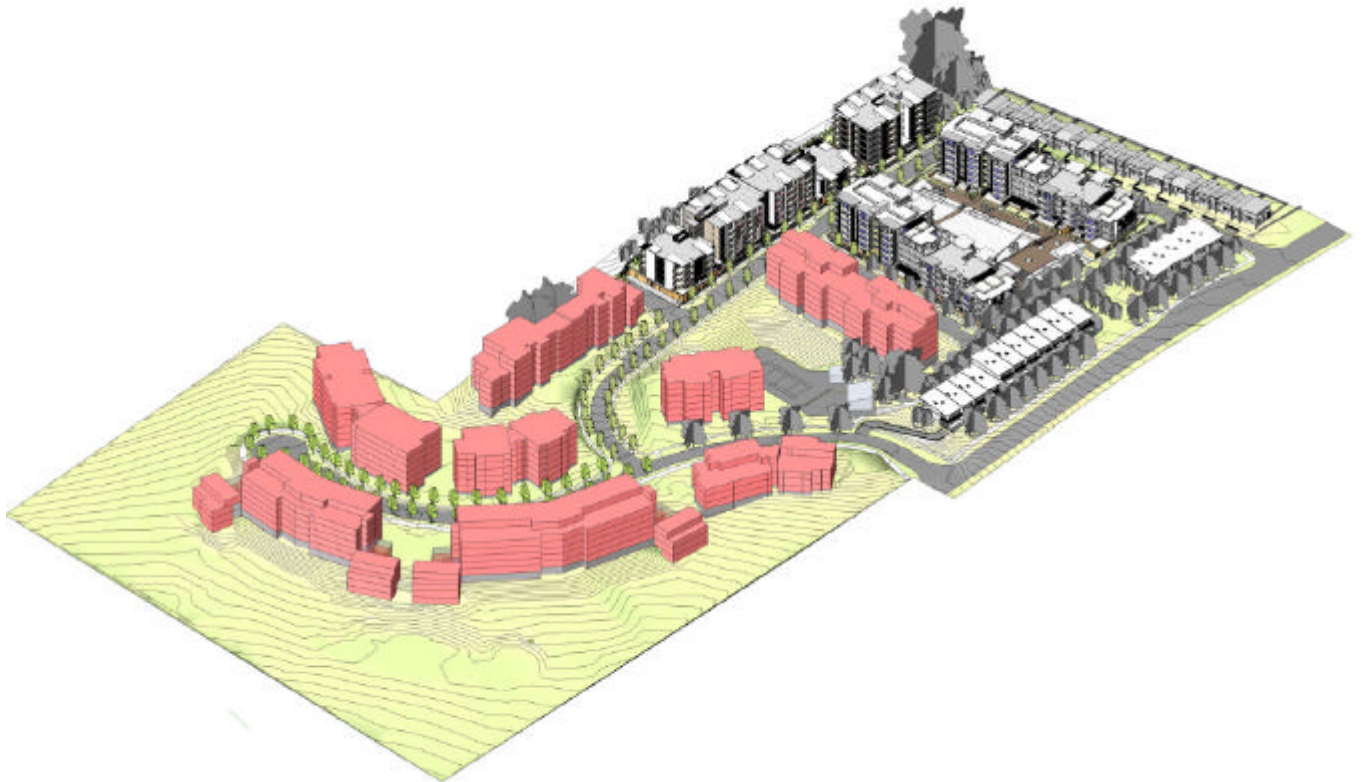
3D perspective view looking south east with building envelope comparison
